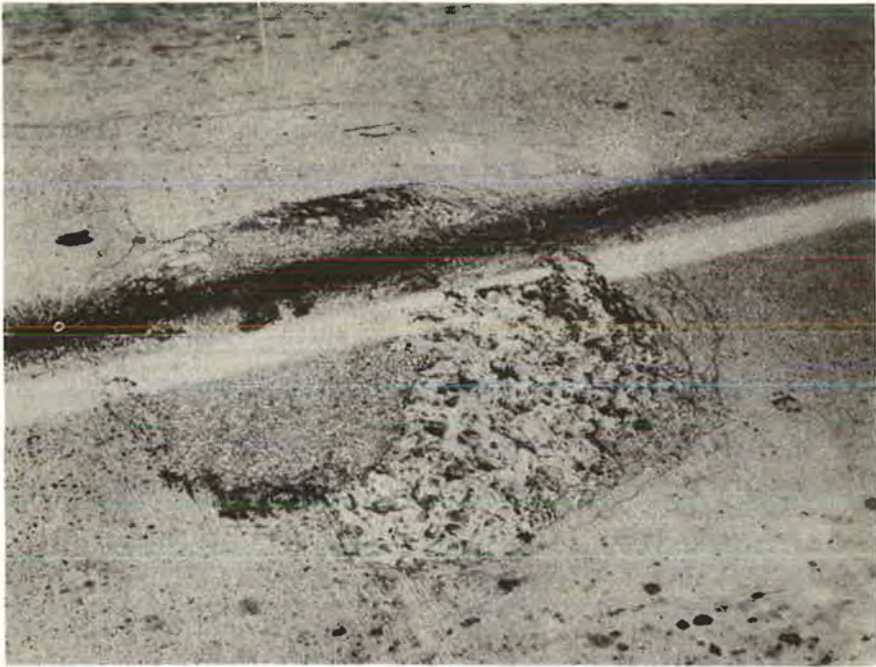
One of the more serious examples of spalling, Section 1 in May 1949.
